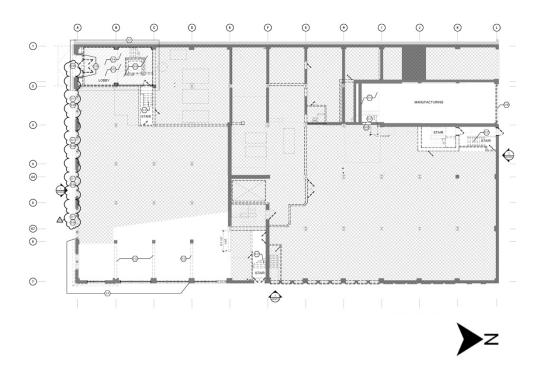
James C. Curtis & Co. Building – 2nd floor plan. Note: plans date to 2018 and show demolition scope that was not executed.
